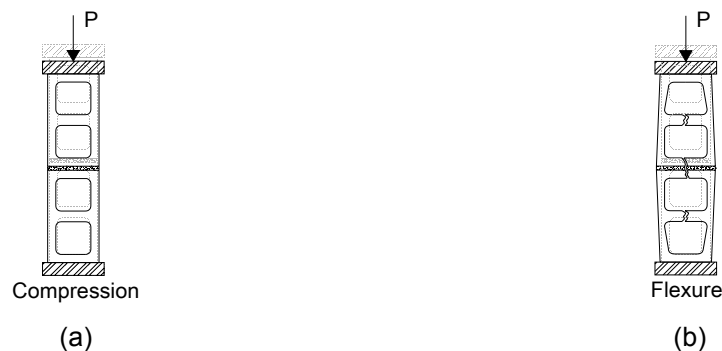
Behaviour of masonry under compression in the direction parallel to bed joints:
